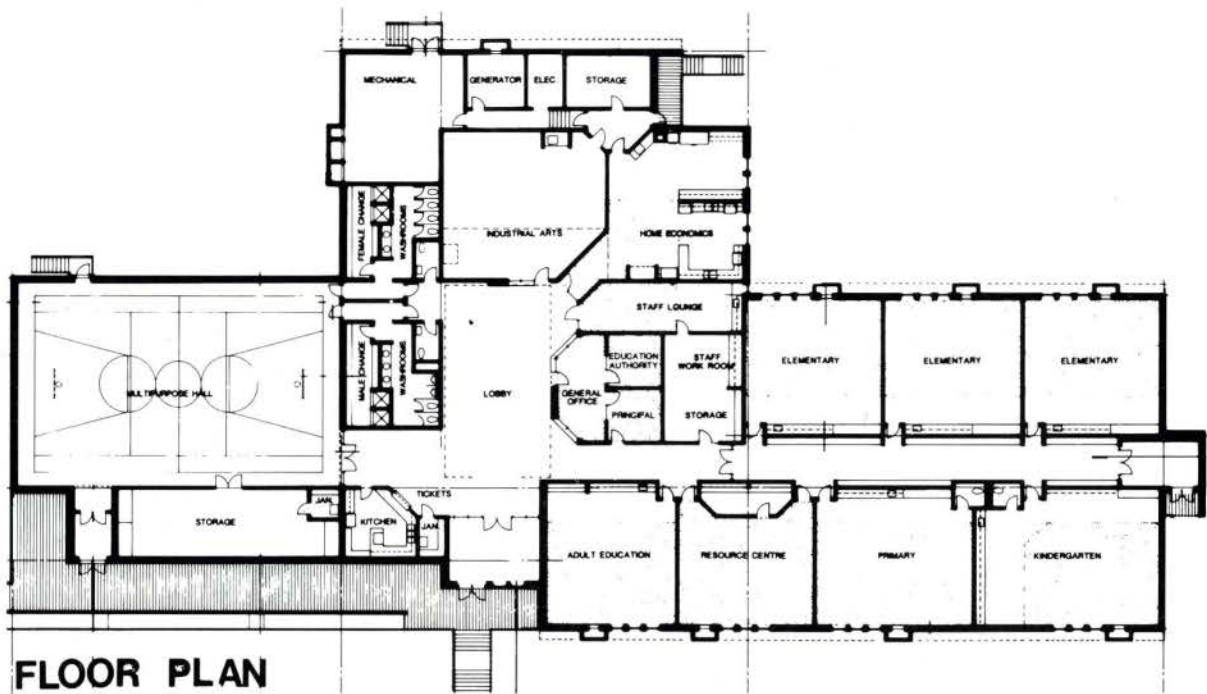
Holman School, Holman, NWT (1984). Floor plan.
